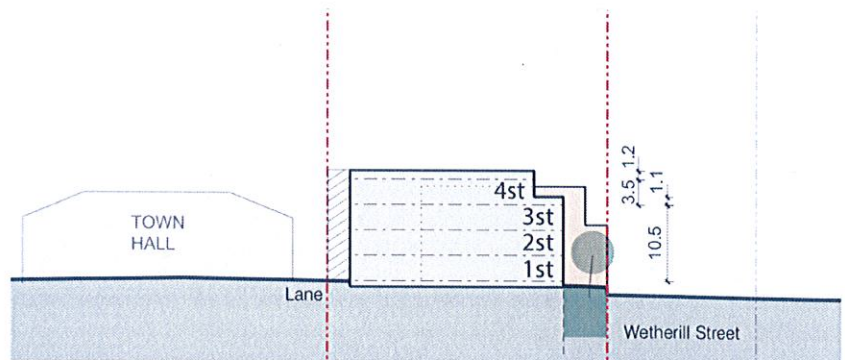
Wetherill Street _ Building envelope Commercial floor heights Section A-A
